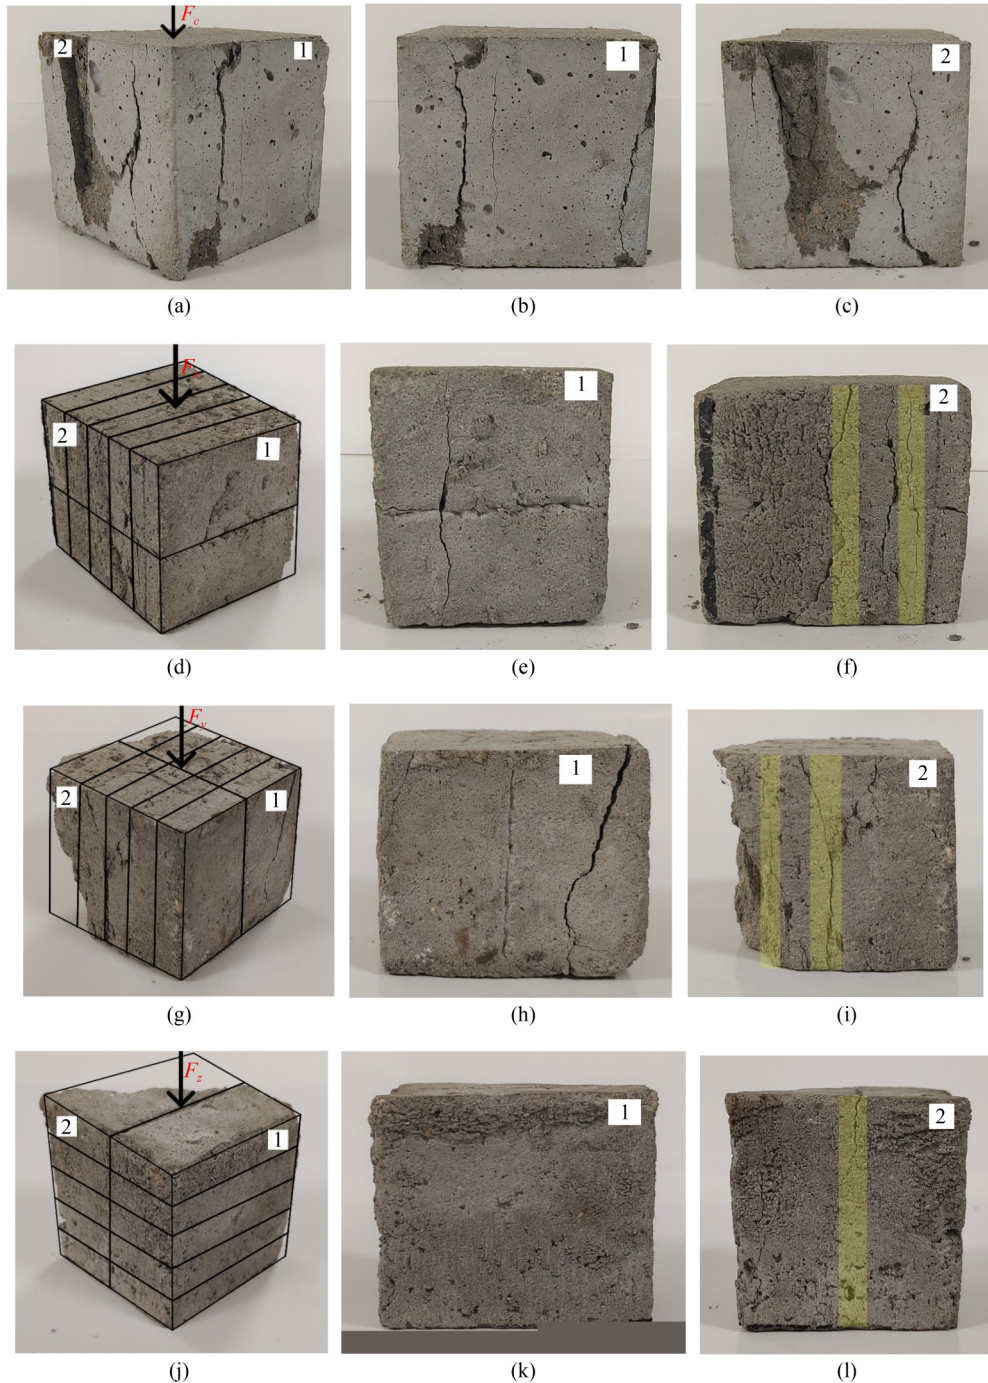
Failure images of (a) isometric view of conventionally cast specimen; (b) Face-1 of conventionally cast specimen; (c) Face-2 of conventionally cast specimen; (d) isometric view of 3DCP specimen loaded in x -direction; (e) Face-1 of 3DCP specimen loaded in x -direction; (f) Face-2 of 3DCP specimen loaded in x -direction; (g) isometric view of 3DCP specimen loaded in y -direction; (h) Face-1 of 3DCP specimen loaded in y -direction; (i) Face-2 of 3DCP specimen loaded in y -direction; (j) isometric view of 3DCP specimen loaded in z -direction; (k) Face-1 of 3DCP specimen loaded in z -direction; (l) Face-2 of 3DCP specimen loaded in z -direction.
